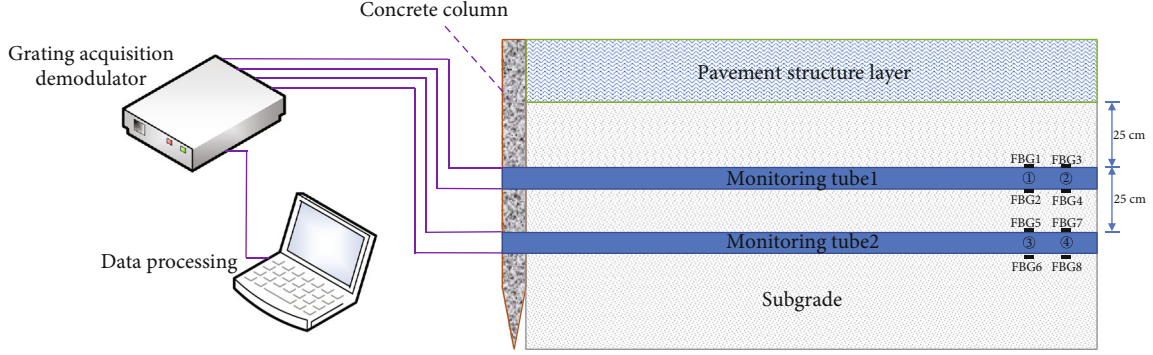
Cross-sectional layout plan of monitoring tubes.
